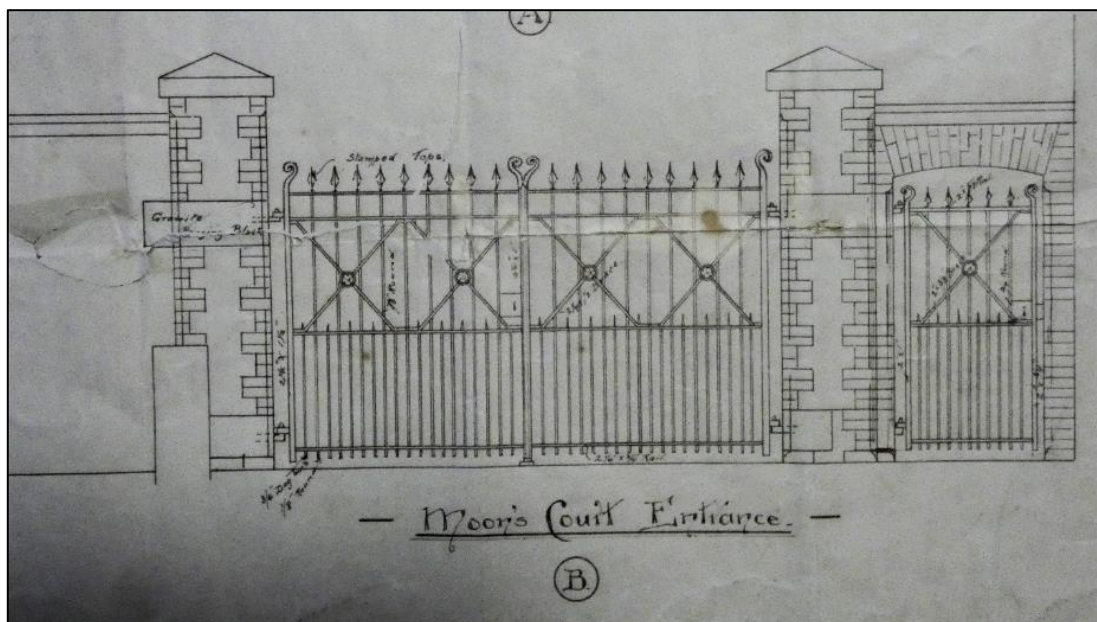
Sansom's design c 1905 for the gate to the market area from Moon's Court (Fair Park Road), looking south.
